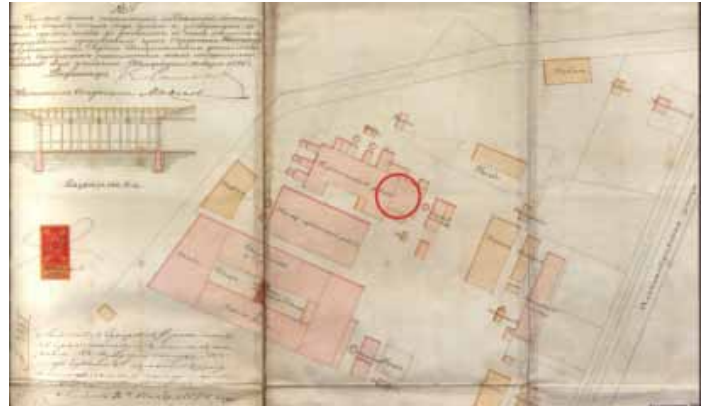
Plan of the puddling, rolling, stretching, rinsing, tempering, galvanizing and nail producing units of „Böcker & Co”. Architect P. M. Bertschy. [6, 9]
